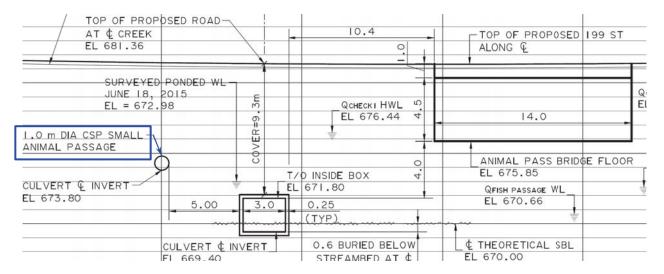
Cross-sectional representation of the 1.0 m diameter small animal culvert, stream culvert (Concrete Box Culvert option) and open-span bridge.²
